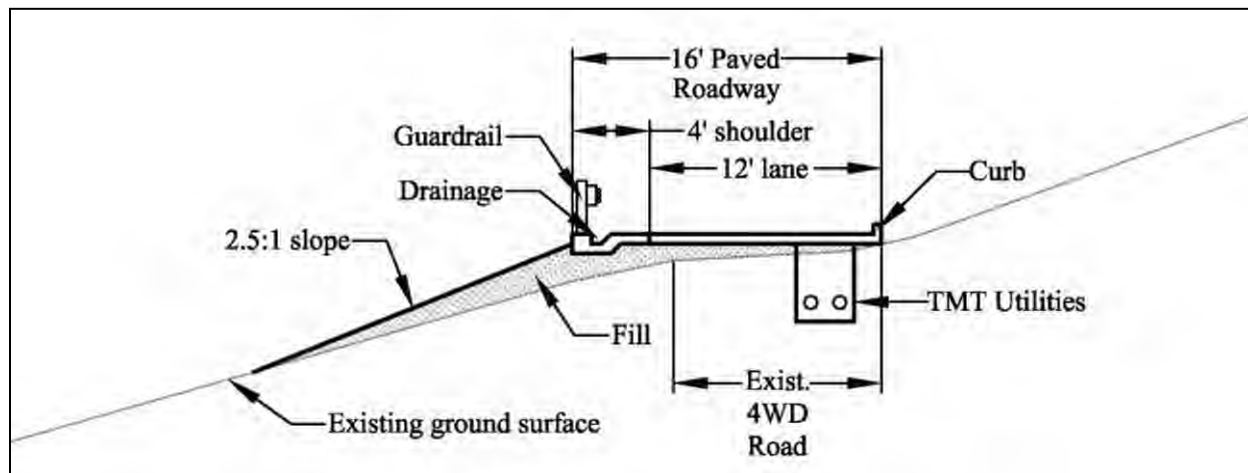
Cross Section of Access Way in Southernmost Cinder Section Overlapping 4-Wheel Drive Road
